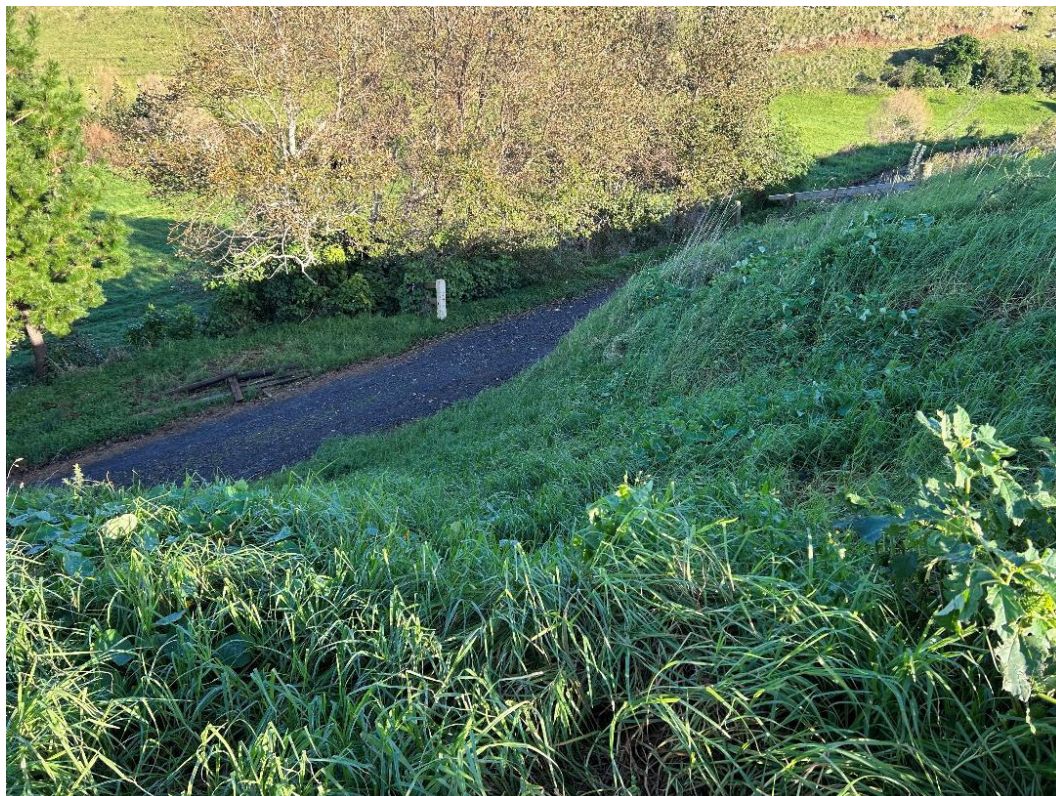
Site view facing northwest overlooking former silage/maize corn storage pit. This is located approximately 40 m northwest of the proposed development.
